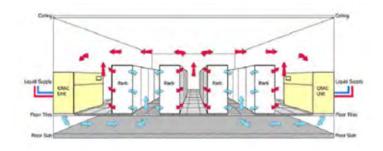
Hot/Cold Aisle Cooling Layout [3]
